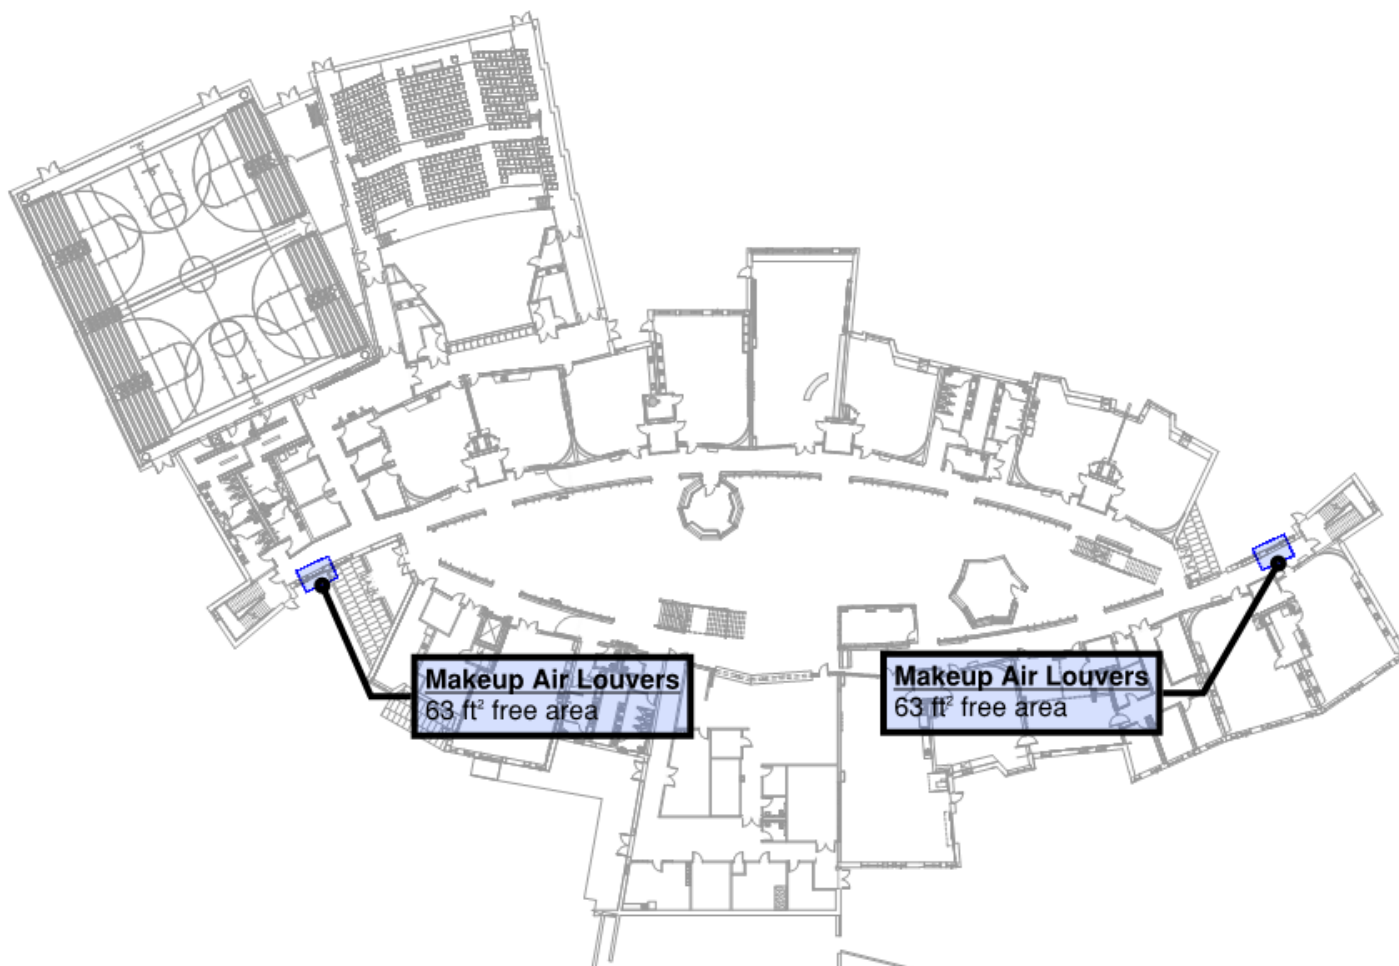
Makeup Air Configuration – Floor 1 (Plan View)
